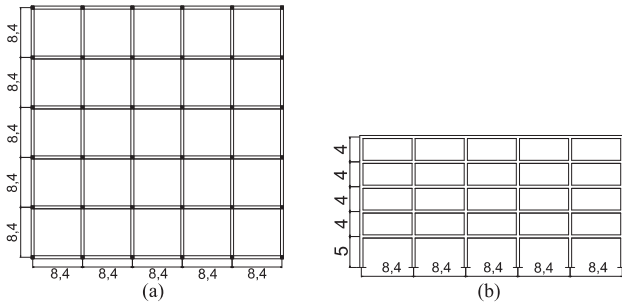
(a) Floor plan and (b) elevation of the building considered in this study (dimensions in m)
